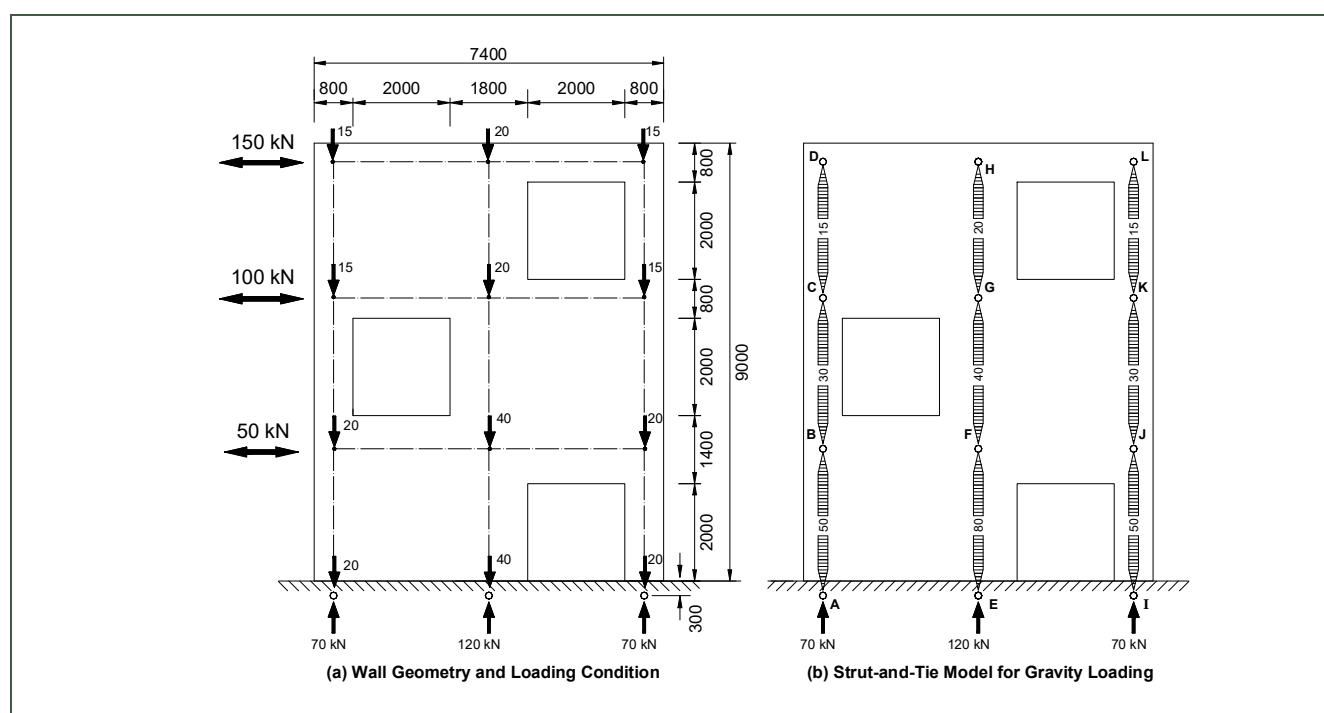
Limited Ductile 3-storey Masonry Wall with Openings
